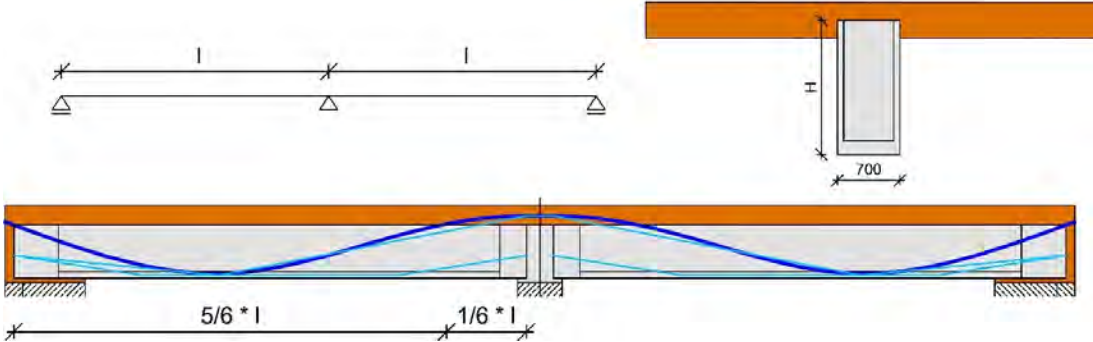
Static system, cross-section and post-tensioning of construction phase 3
